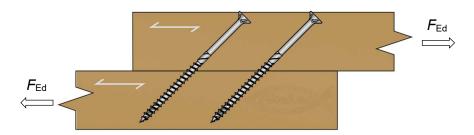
Shear connection with inclined screws timber-to-timber connection (figure not to scale)
